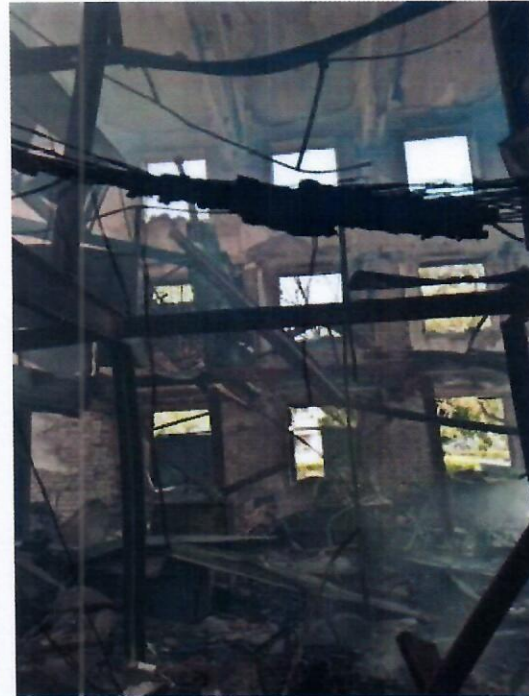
Burnt Out Ground and First Floor of Southern Wing of Main Building
